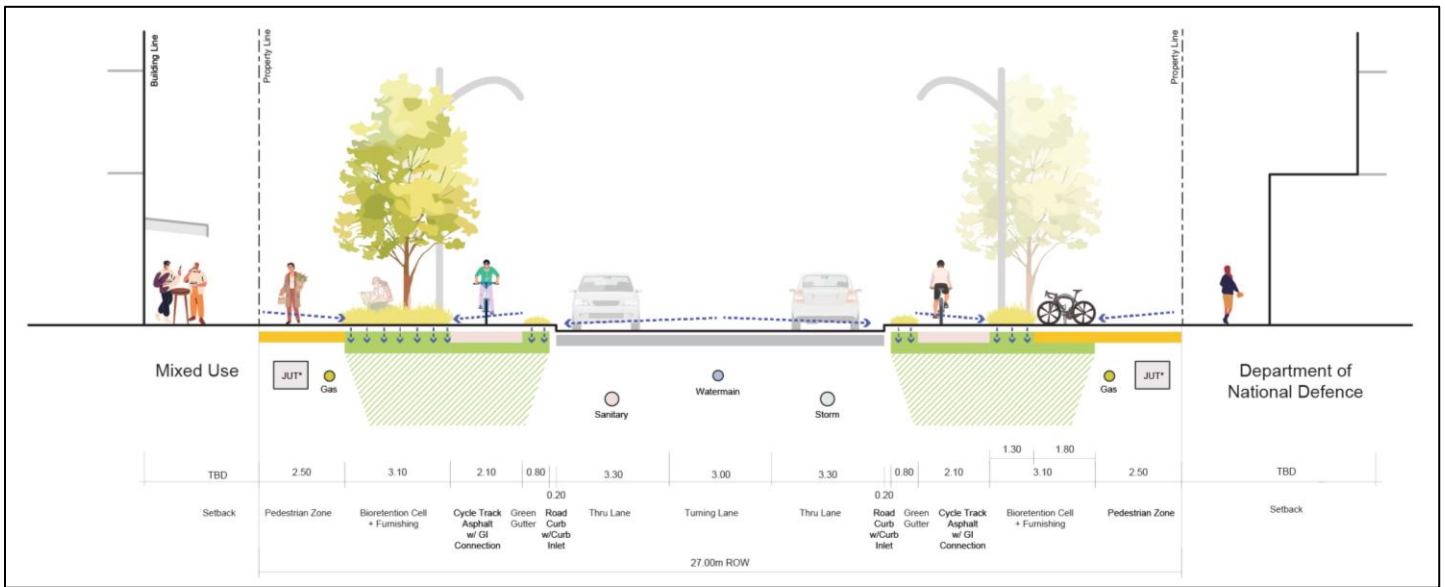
Northern Street (Billy Bishop Way to Sheppard Avenue West) Cross-Section – Option 3
